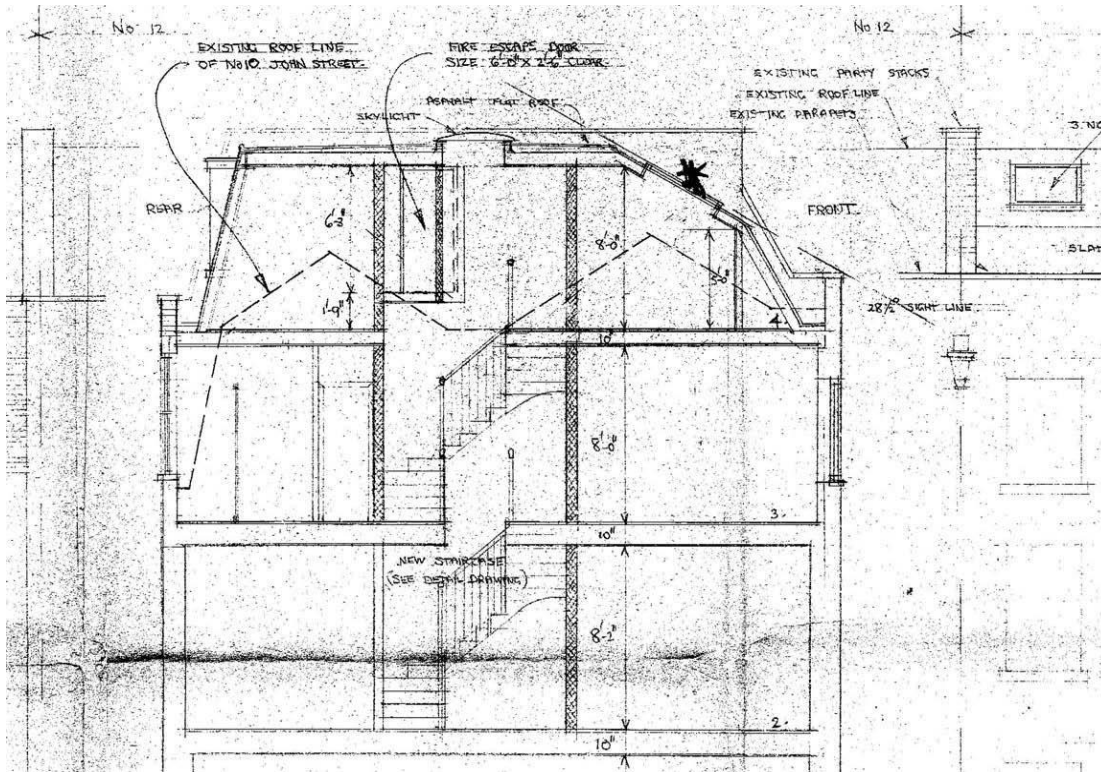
A section from the 1974 application, showing the text 'New Staircase' on the stairs from second to fourth floor.
